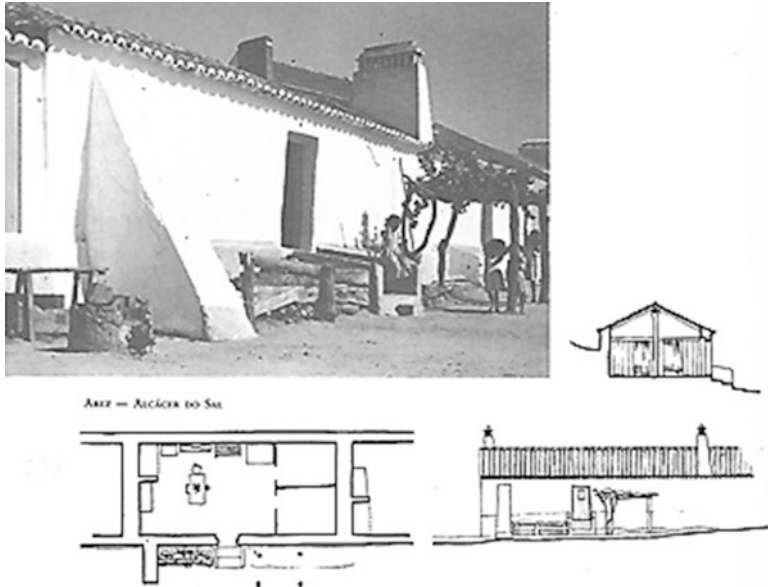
House in Arez, Alcaçer do Sal (AAP 1961)
